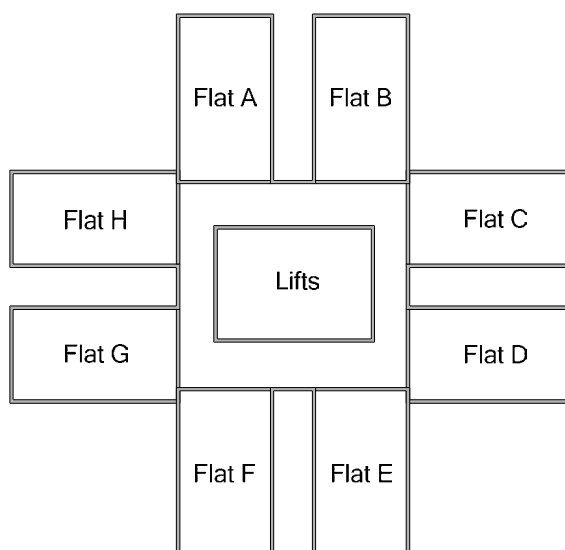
Schematic plan view of the building models in a cross (#) floor plan.
